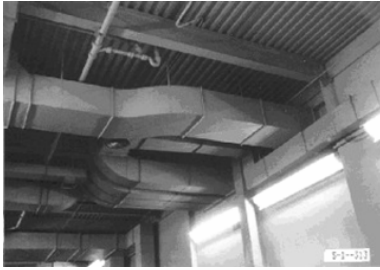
Sylmar Converter Station, 1971 San Fernando Earthquake. Strap-Hung and Wall-Mounted Duct with Wall Penetrations
